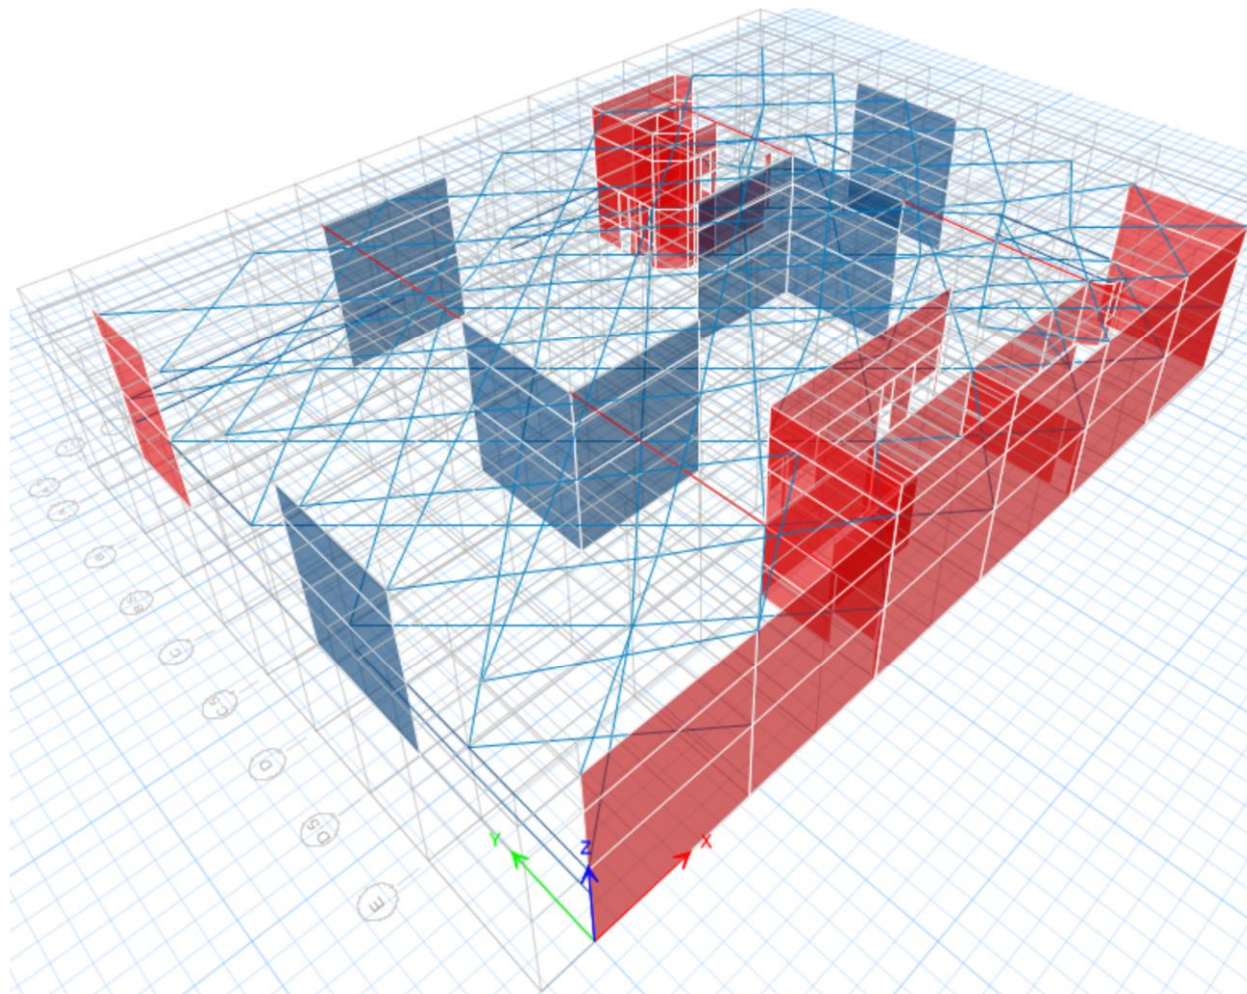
Option No. 2 – ETABS Model – Looking Northeast with X-Bracing
